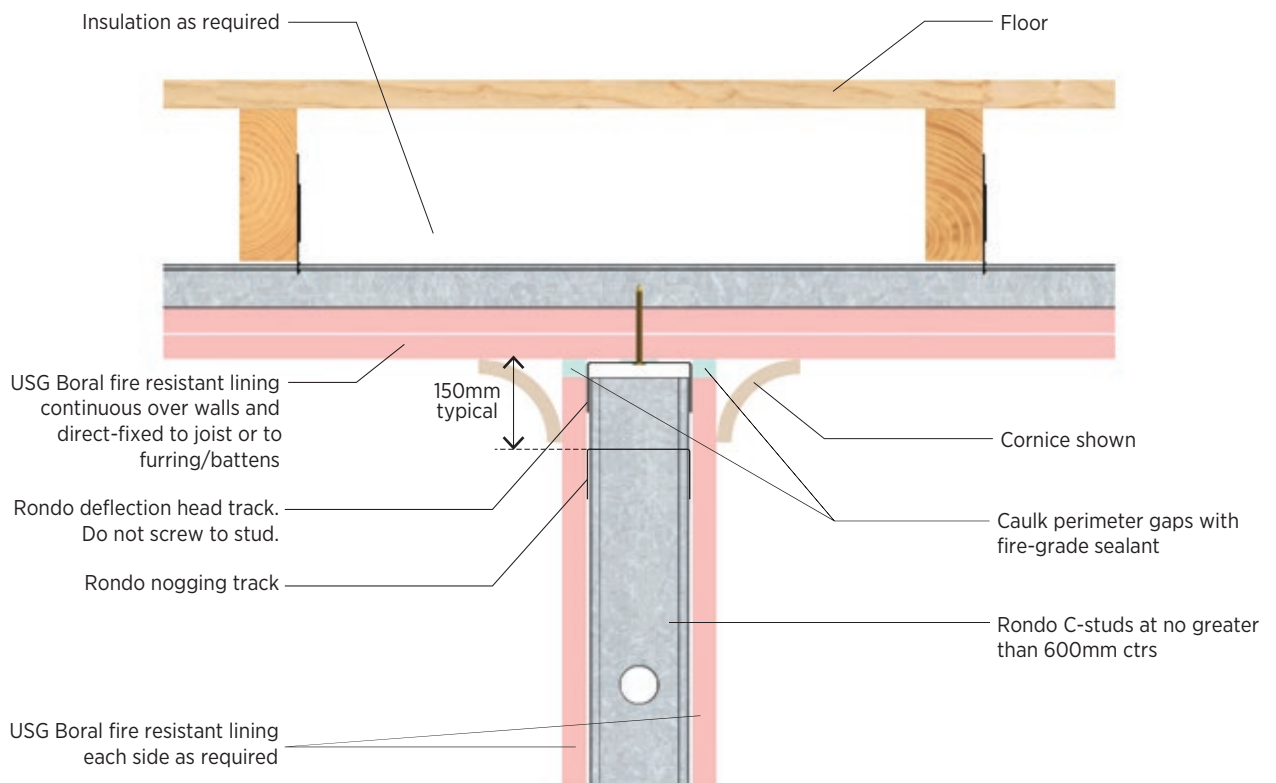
Fire-rated Wall Deflection Head to Fire-rated Ceiling Detail
